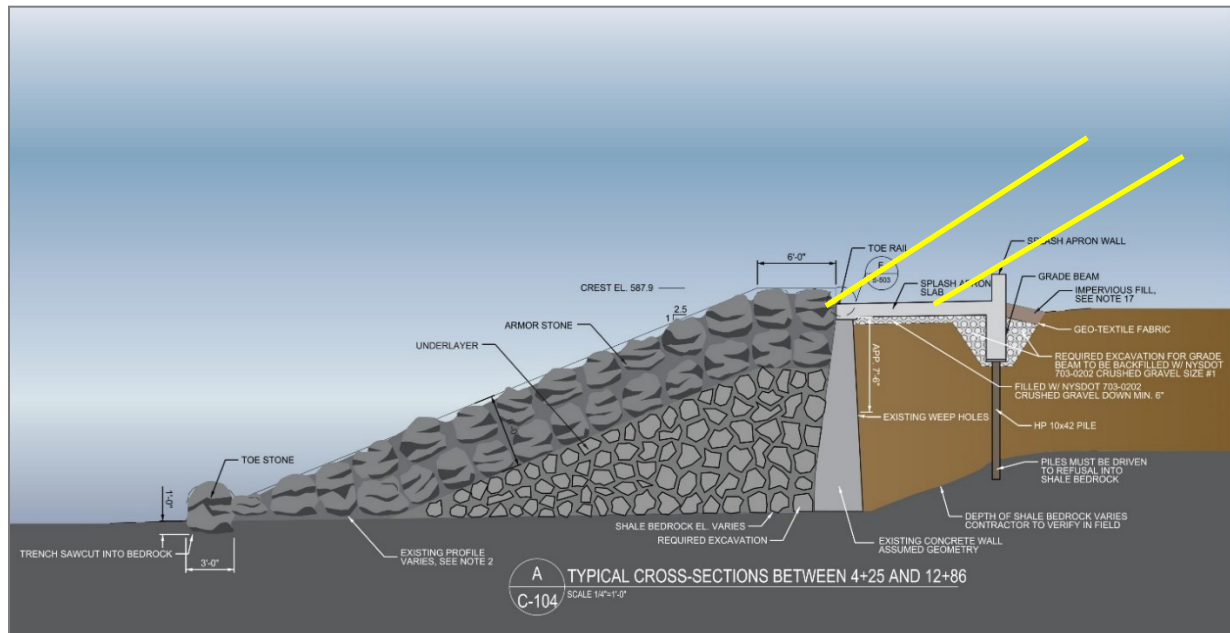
Project concept of Seawall looking north from edge of water depicting project protective features and showcasing project betterment details
